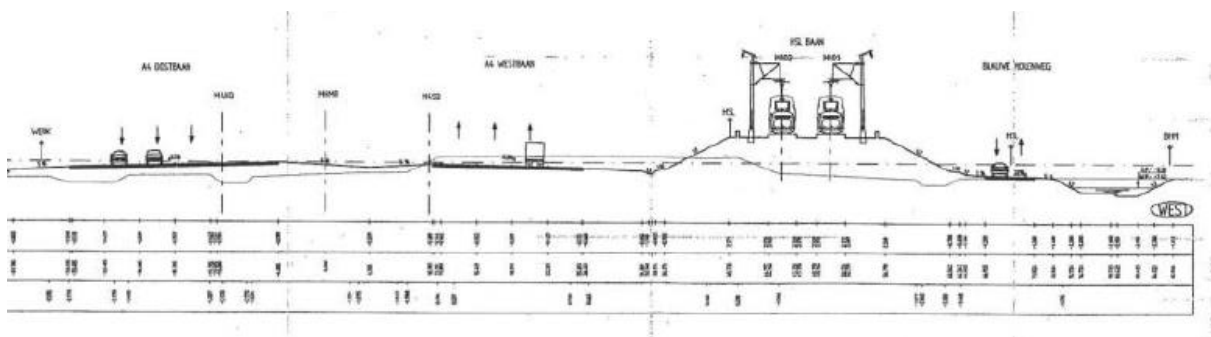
Section of the HSL structure in its surroundings (at KM 132.6)
